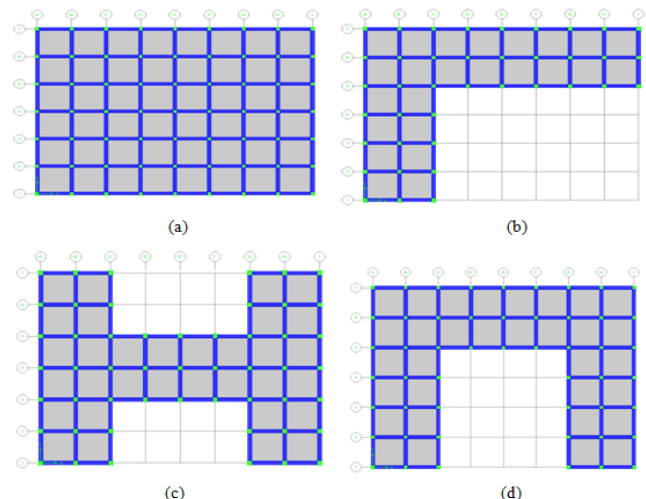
Plan (a) Rectangular (b) L shape (c) I shape (d) C shape of the Building
